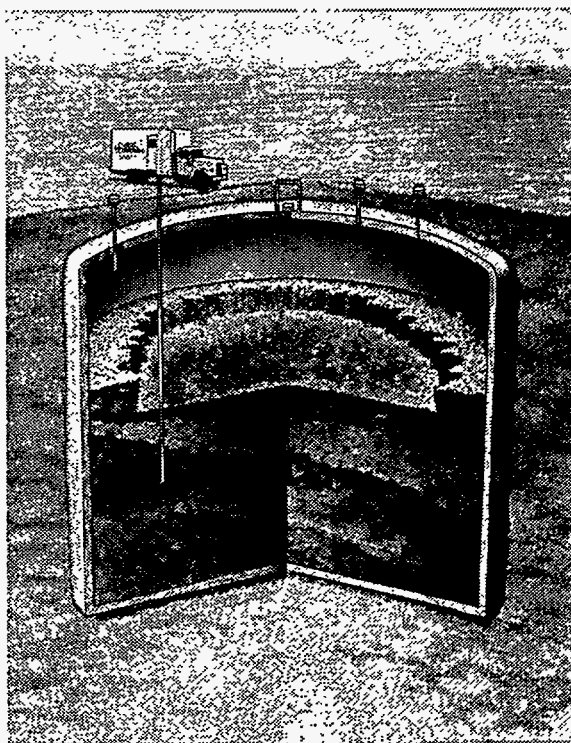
The cone penetrometer will be deployed with a control trailer.
